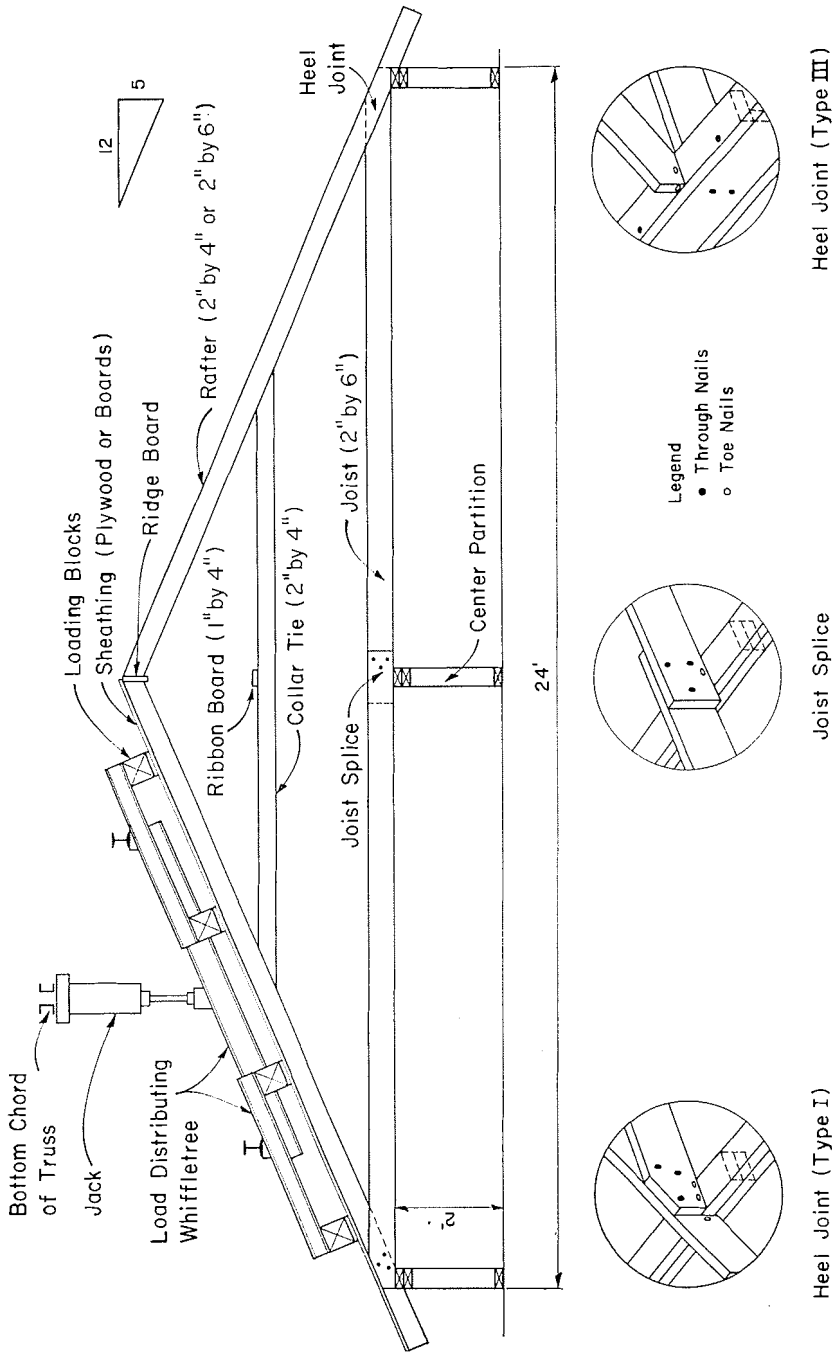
Cross-Section of Typical Roof with Details of Construction and Loading.
